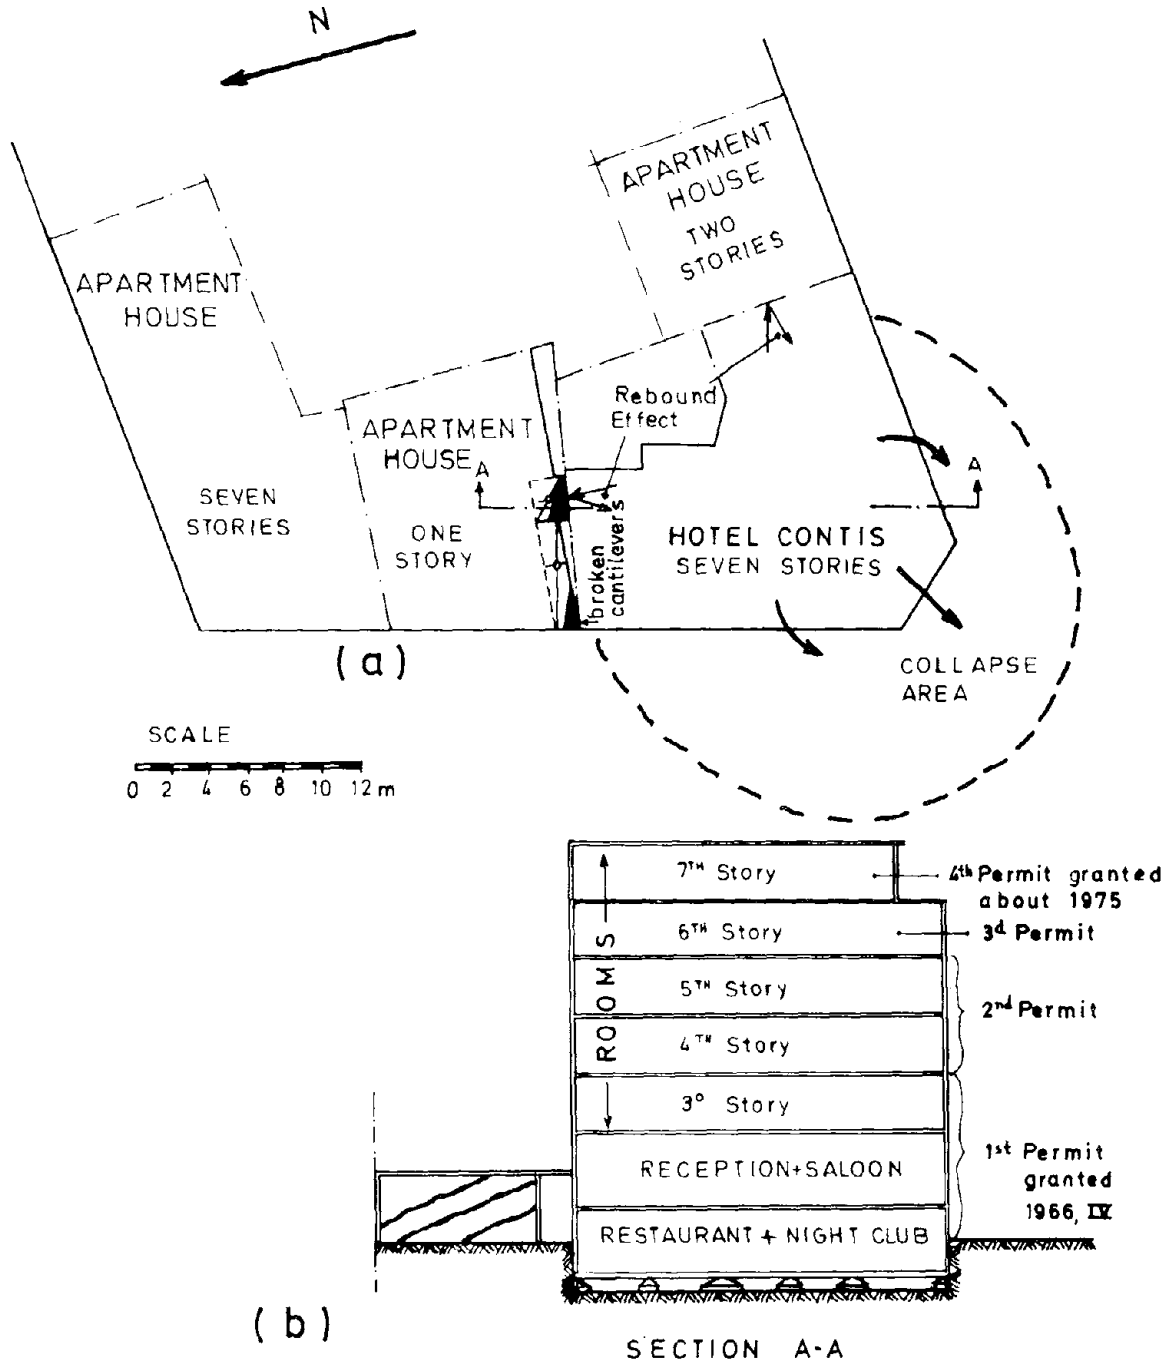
Contis Hotel in Loutraki. Plan and section of the building.
